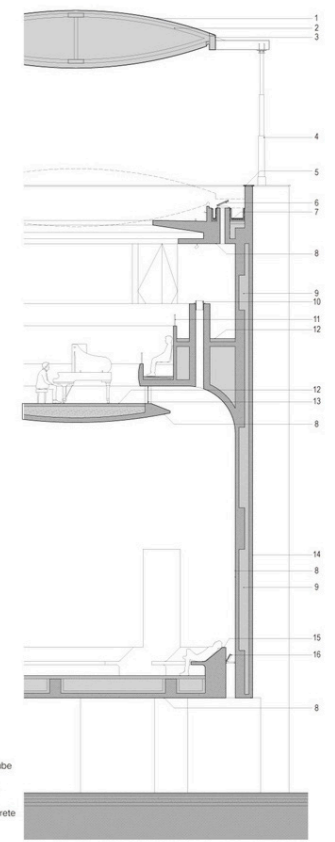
Walls in concert hall. Chapel of Sound, OPEN Architecture, 2021
